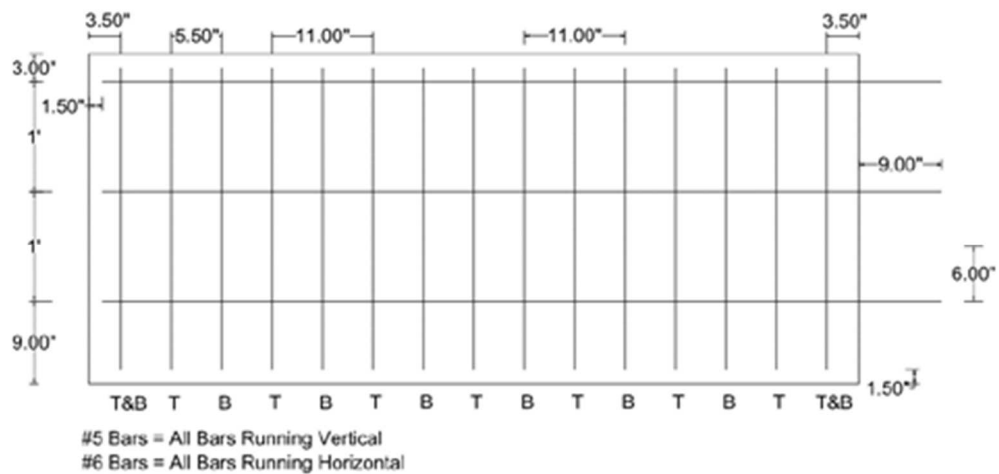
Reinforcing Steel Layout of Left Deck Panel
